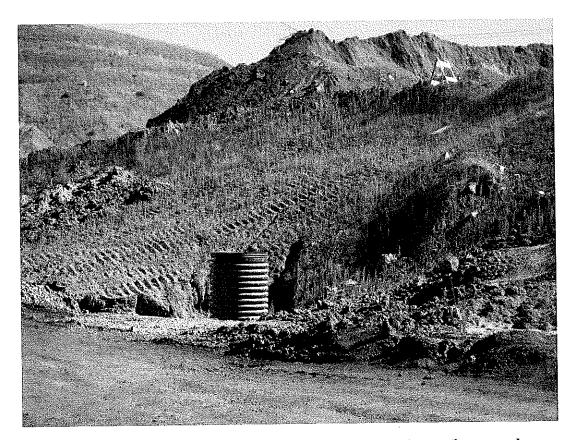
Outfall (check basin) for storm water which will eventually go to the new pond.
